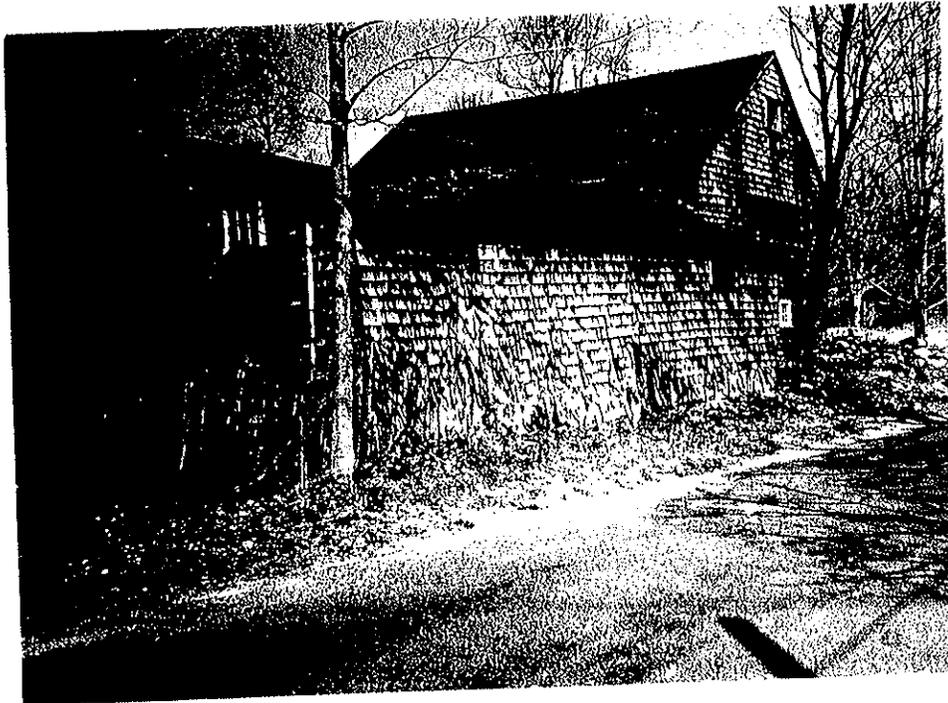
Weir Barn - East Wing, East and South Walls (1992).
